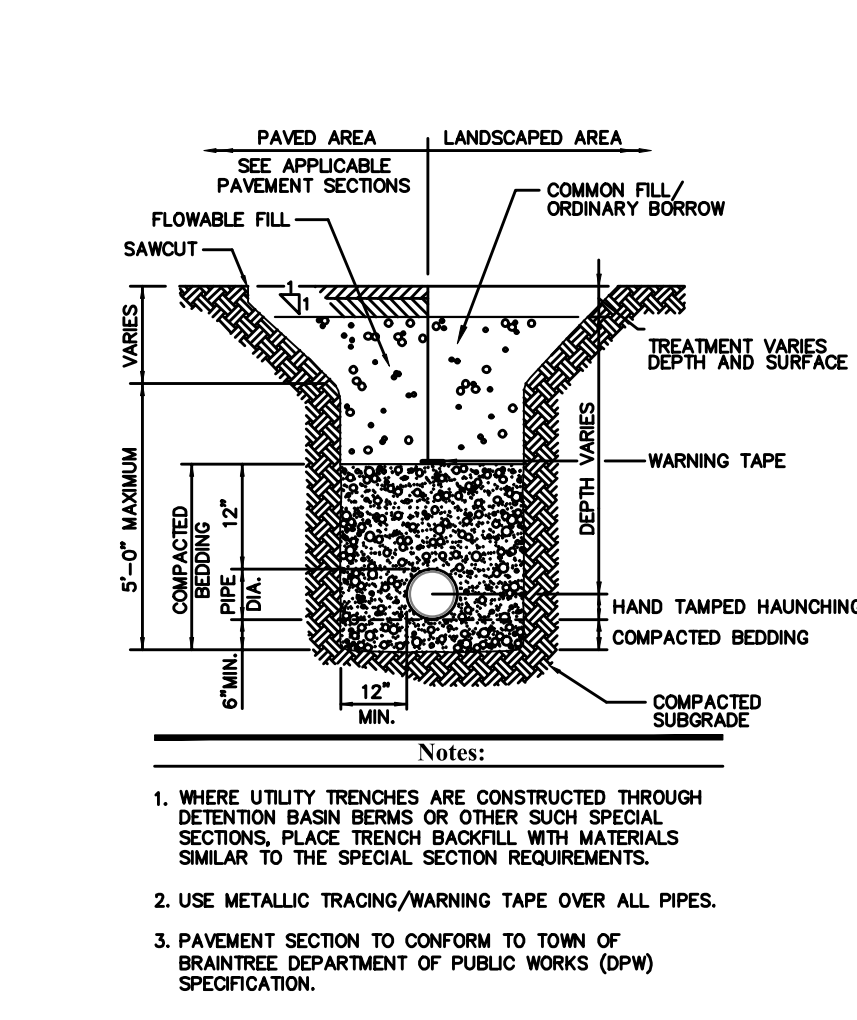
16 Fencourt Ave RANDOLPH, MASSACHUSETTS
